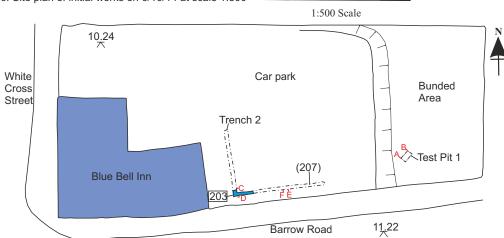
Site plan of initial works on 6/10/14 at scale 1:500
